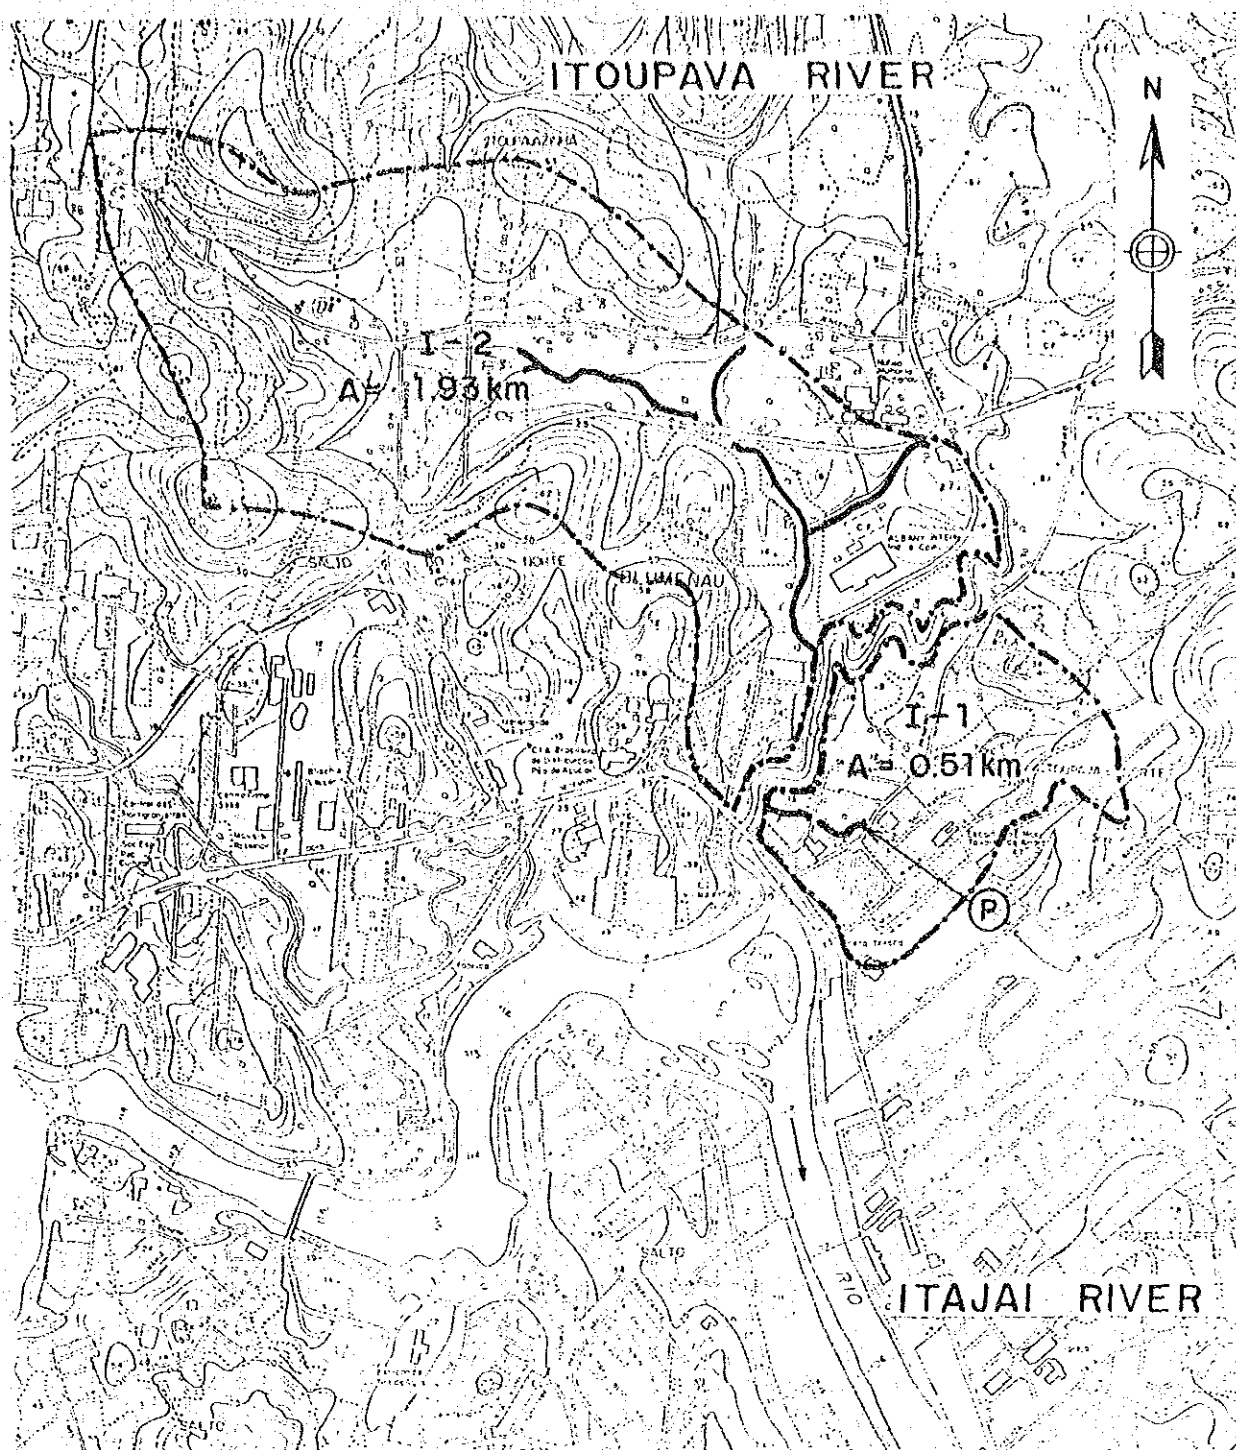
GENERAL PLAN OF DRAINAGE FACILITIES (2/3)
